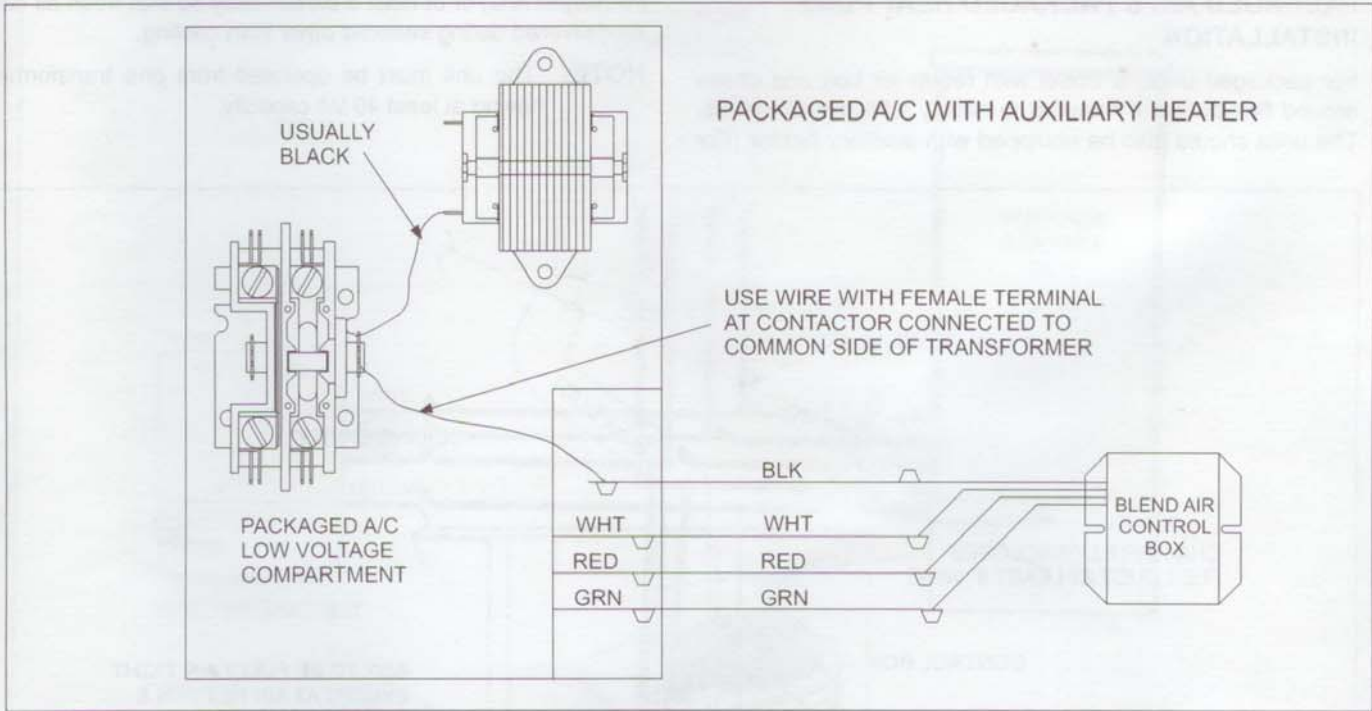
LOW VOLTAGE WIRING FOR PACKAGED A/C
